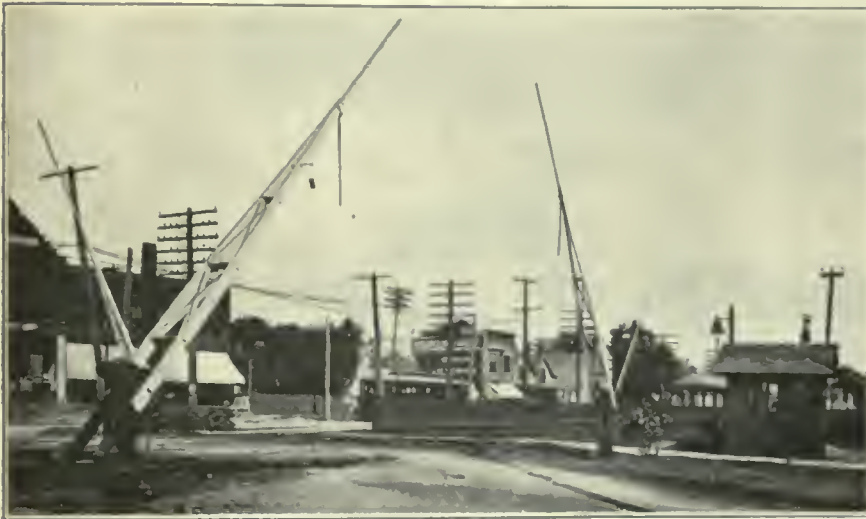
GRADE CROSSINGS. Highway crossing of the Chicago, Burlington & Quincy Railroad at La Grange, Ill.
